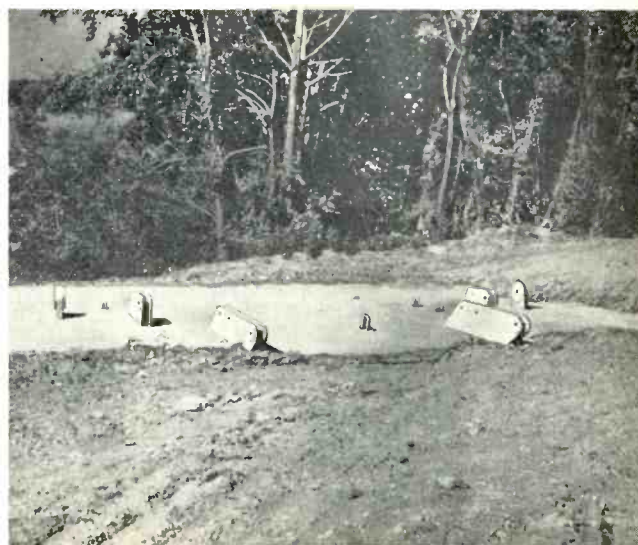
Three guy-anchor points, each identical to the one shown here, are used to support this tower. Extra anchor points were installed for future elevation of the structure. The anchors are 16 feet deep and 33 feet on a side, made of reinforced concrete.
